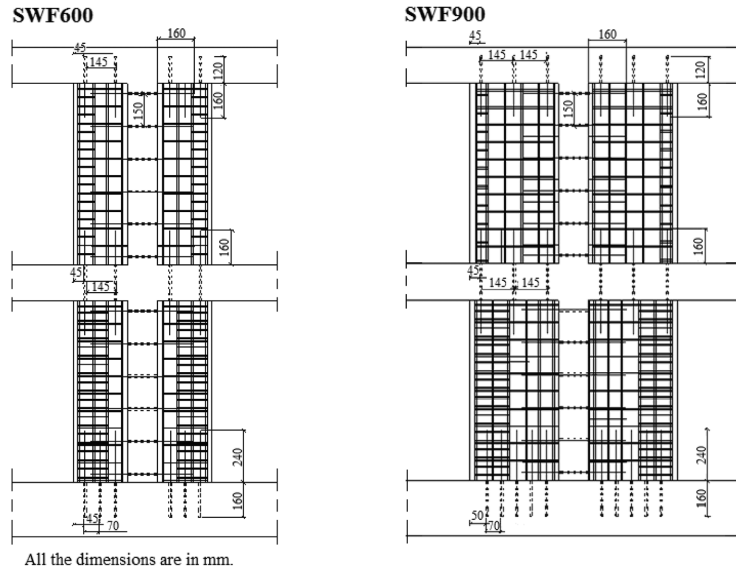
Dowel spacing and embedment lengths of anchorage bars
